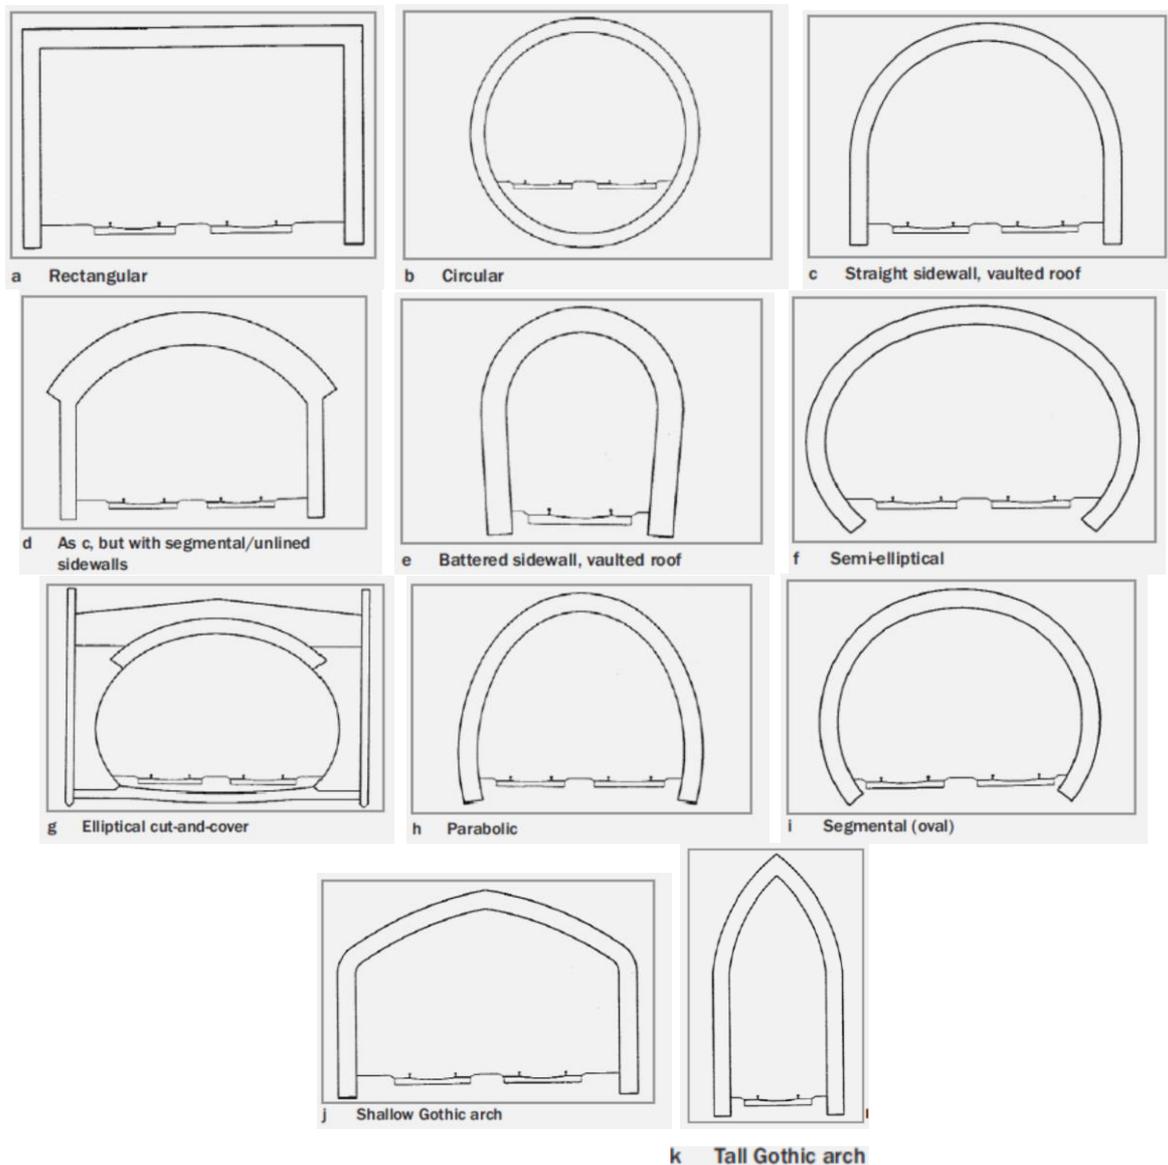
Typical UK tunnel cross sections (Railtrack 1996)
